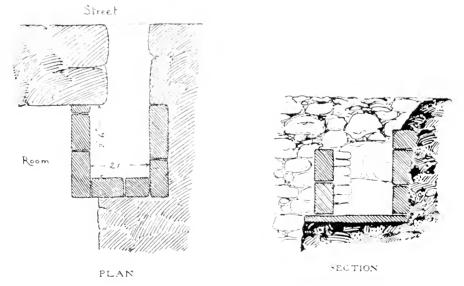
Plan and Section of Small Chamber in G 3:4.
